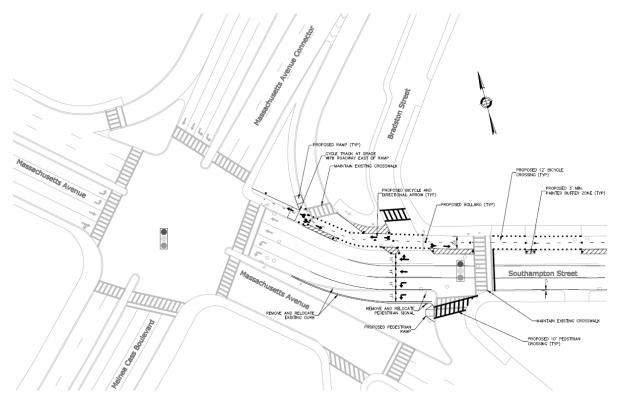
A: Proposed Massachusetts Ave. and Melnea Cass Boulevard Intersection Improvements
